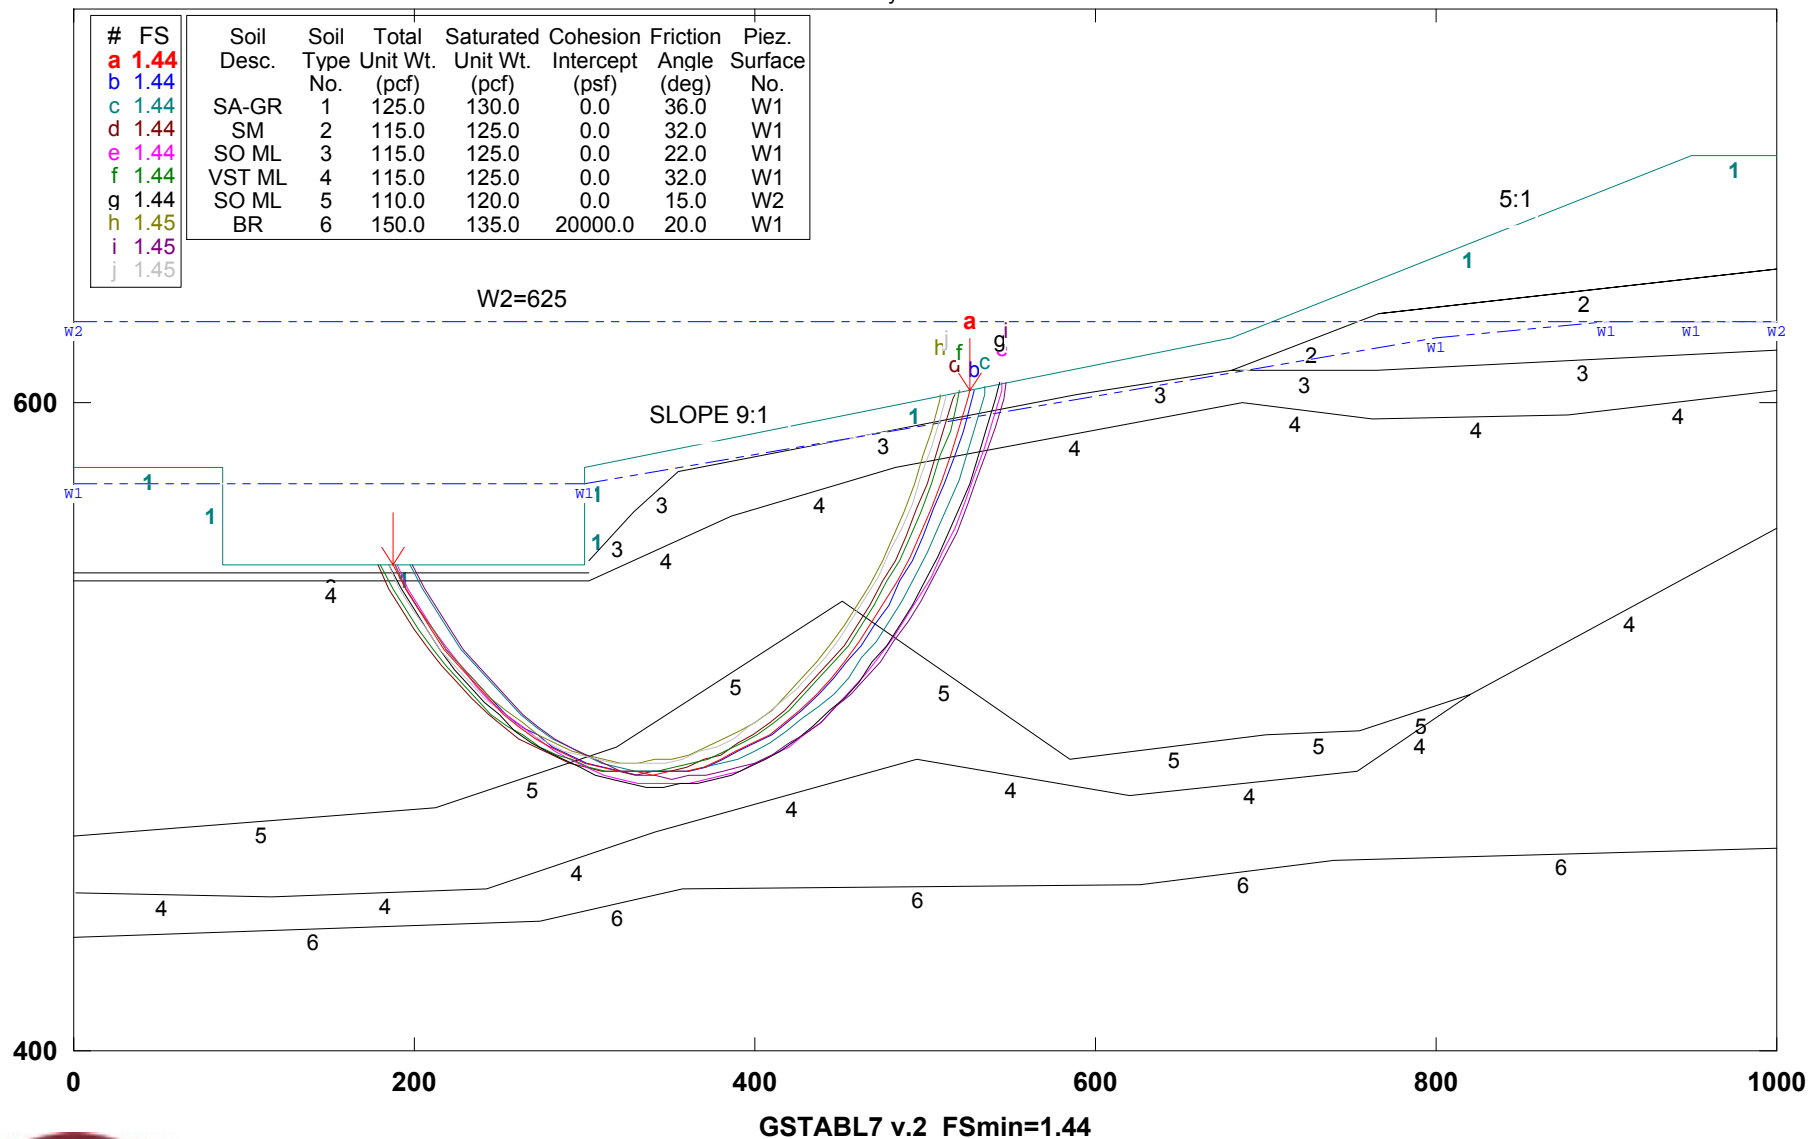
B.27: Slope Excavation using (5:1 and 9:1) slopes.
